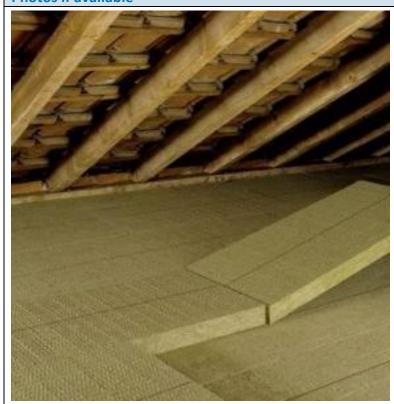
Insulation example on top floor @ ZEBAU GmbH
